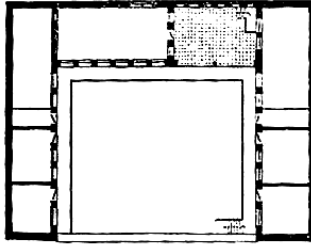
The plan type without the *sofa*, Bayram Güllaç House, Diyarbakır.
